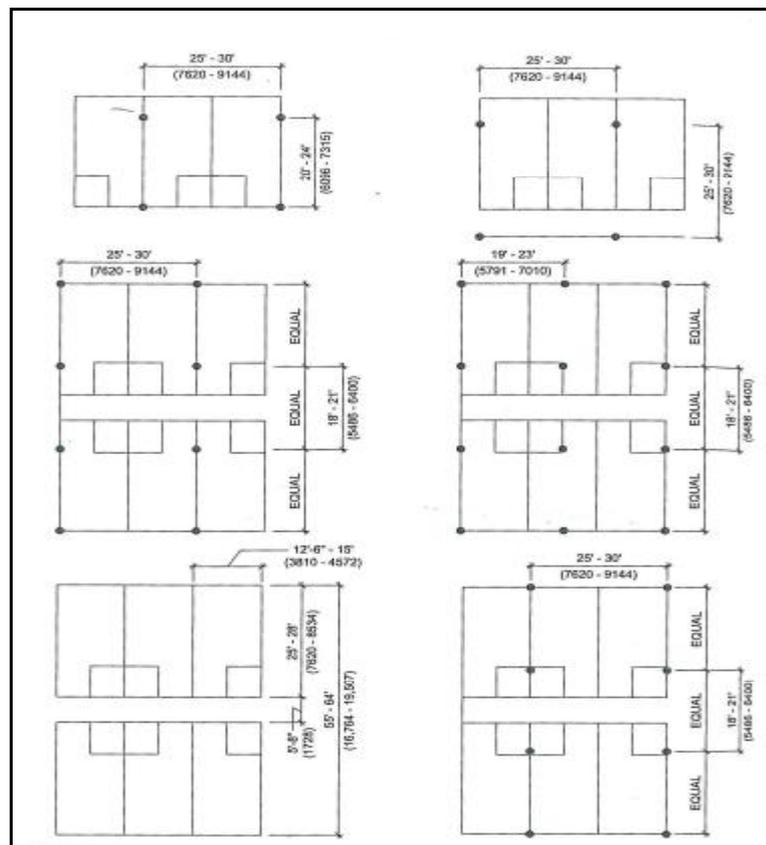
Typical structural bays for hotel guestrooms. (McGOWAN & KRUSE, 2004, 384).
